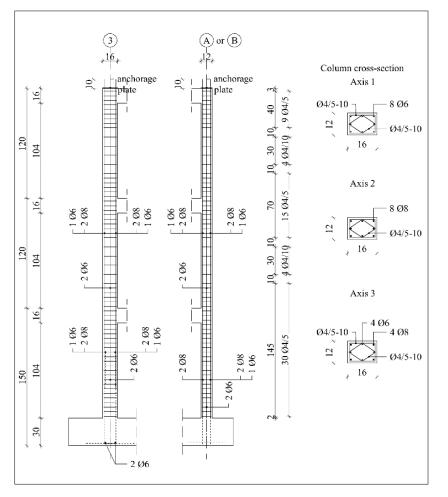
Column reinforcement details (units in cm except for bar sizes)
